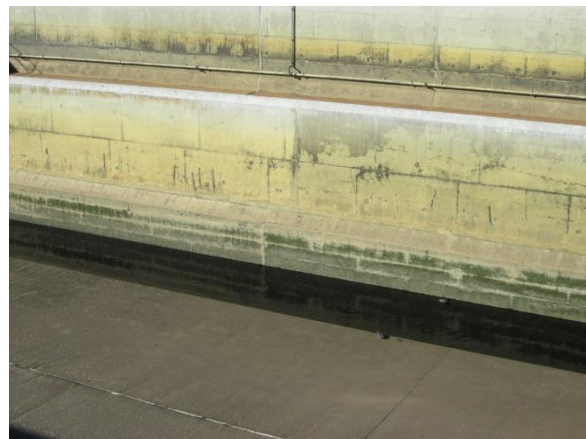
Spalling over vertical bars in west (dividing) wall.
